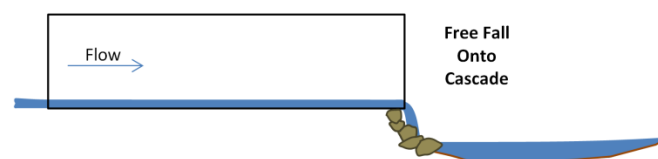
Diagram depicting a culvert with a free fall onto a cascade at the outlet. (Image credit: NAACC)
